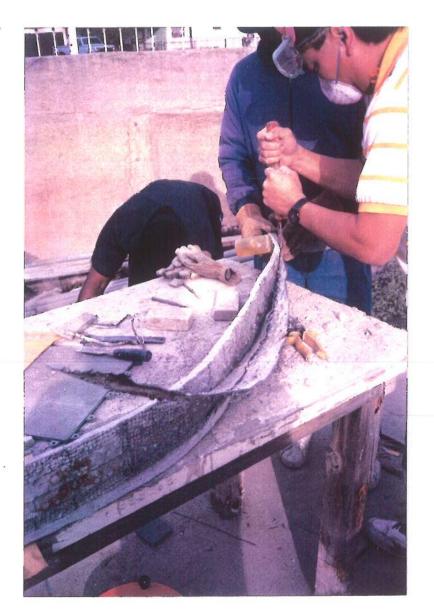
Damaged sheet metal rebar being removed on bench from Maj Band 01. Dec 1991. ATO B N.
